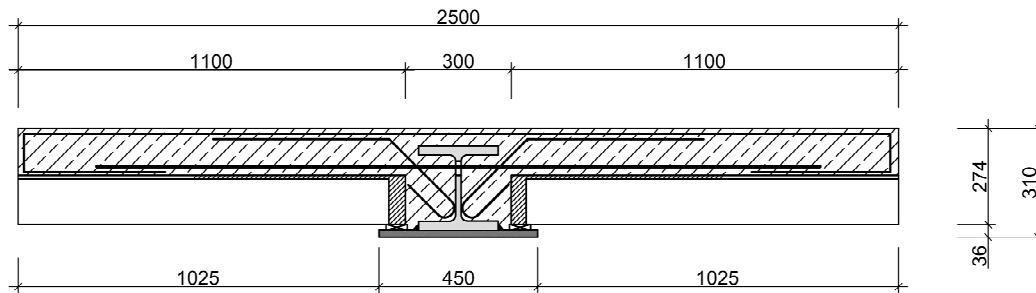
Beam test section: S1 & S2, B1 & B2
